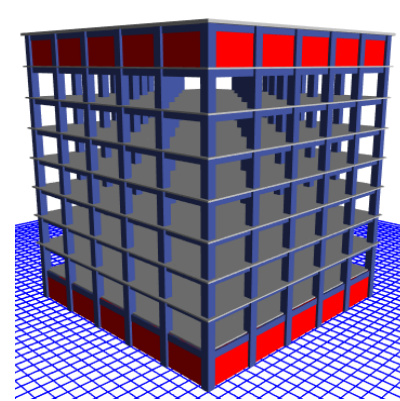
Model 9 (3D View of the RC wall in eighth storey)
